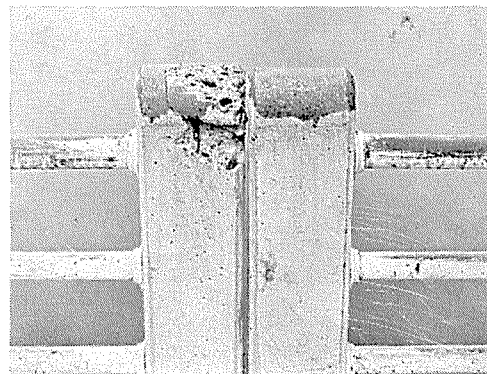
Spalling of concrete at top of hand-railpost (Shiroyama Bridge)
